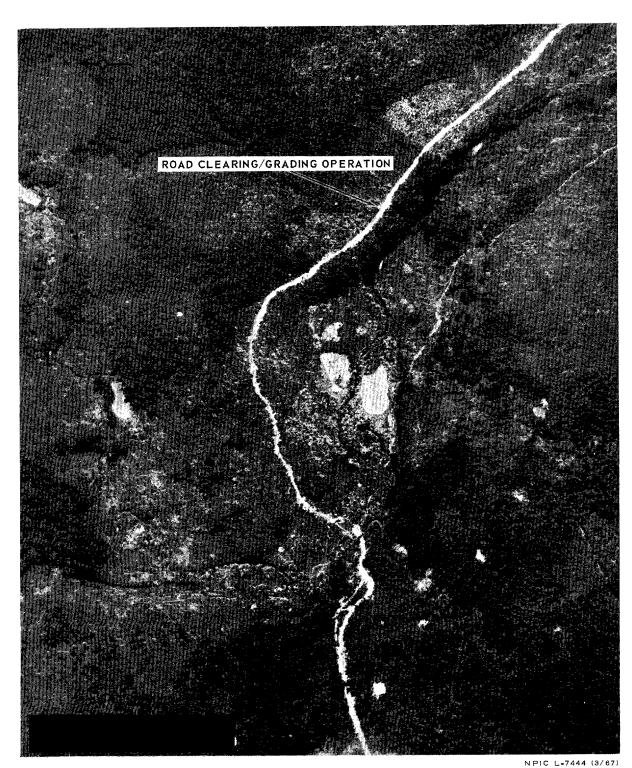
ROAD CONSTRUCTION (16-21N 107-08E), LAOS/SOUTH VIETNAM BORDER AREA
